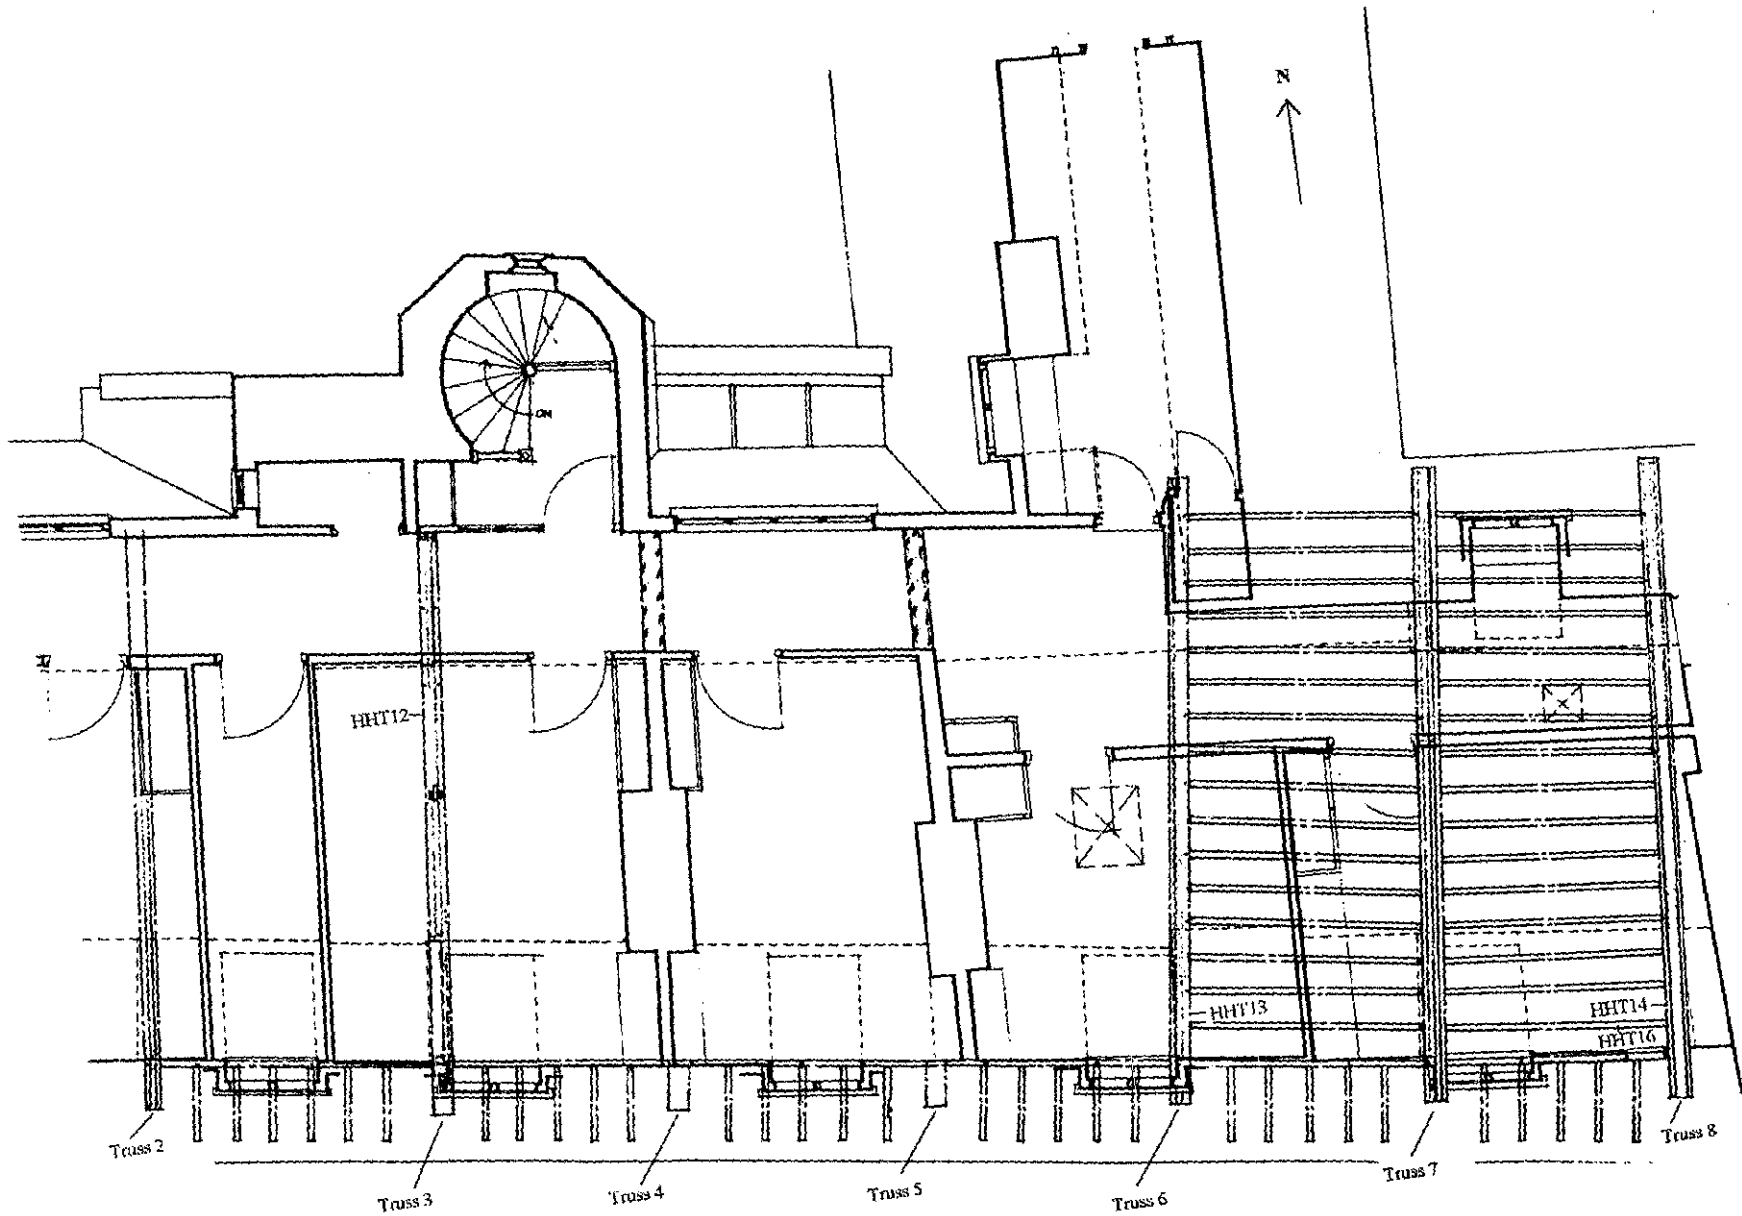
Plan of the first floor of the north west wing, Hill Hall, Essex, showing the truss numbering, and locations of samples taken for dendrochronology
